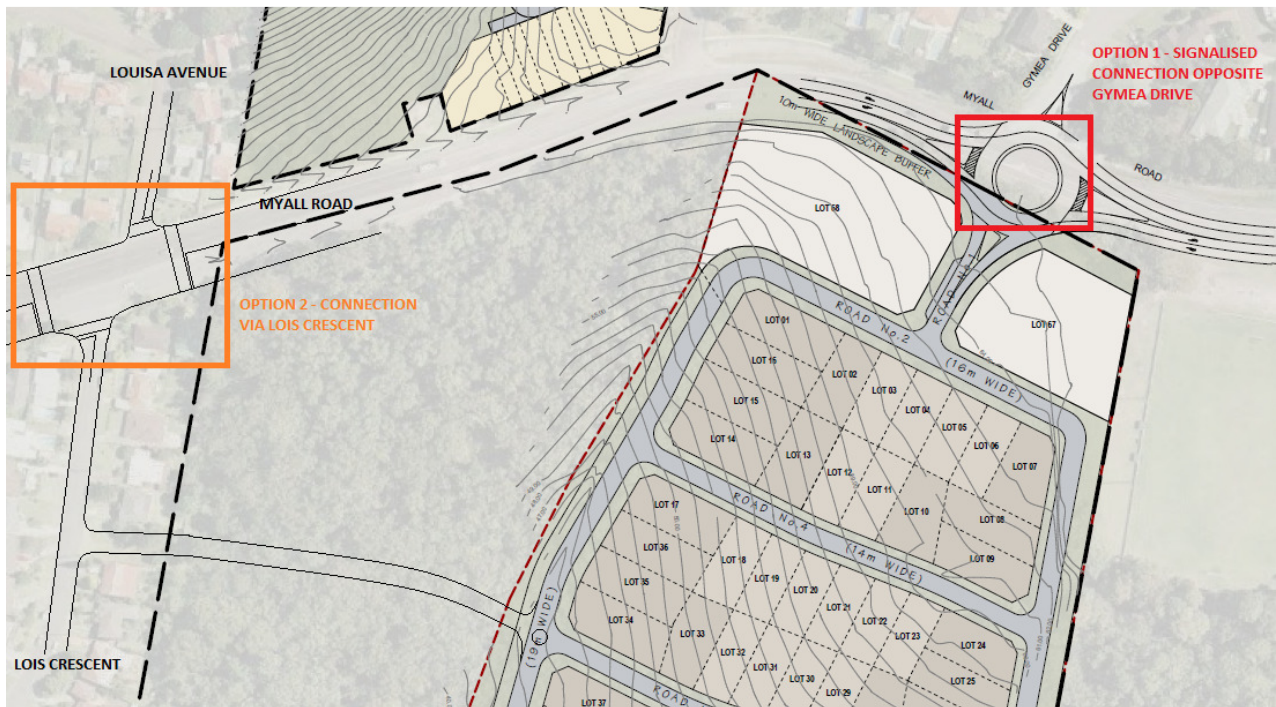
Possible connection of Gymea Drive to Prospect Road.
